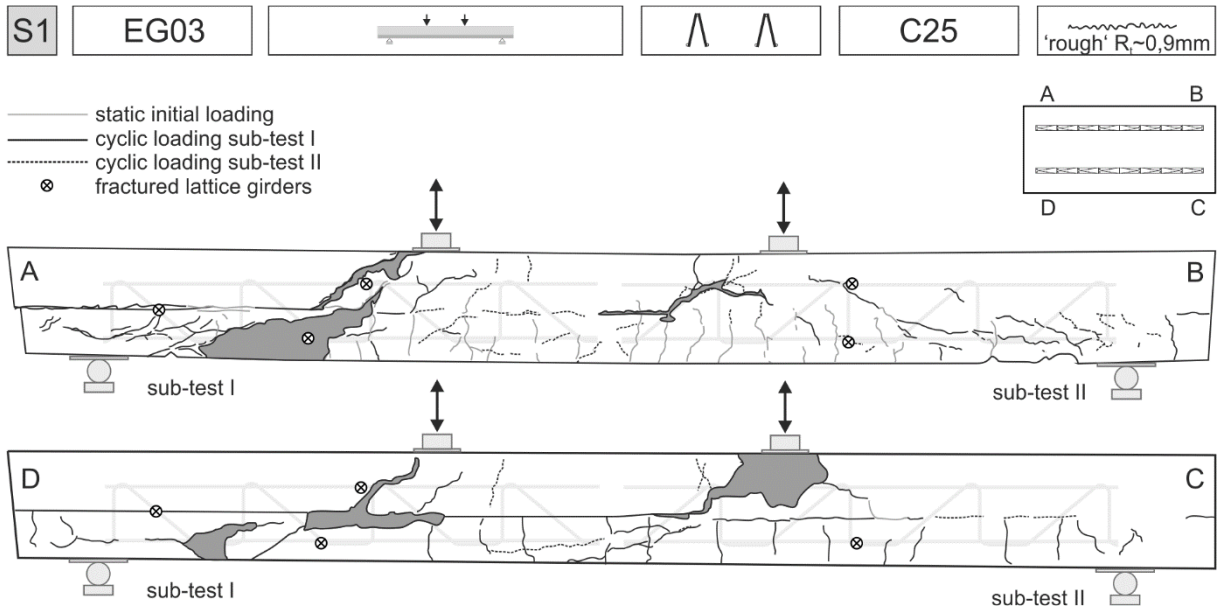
Test parameters, crack patterns and lattice girder fractures of specimen EG03
